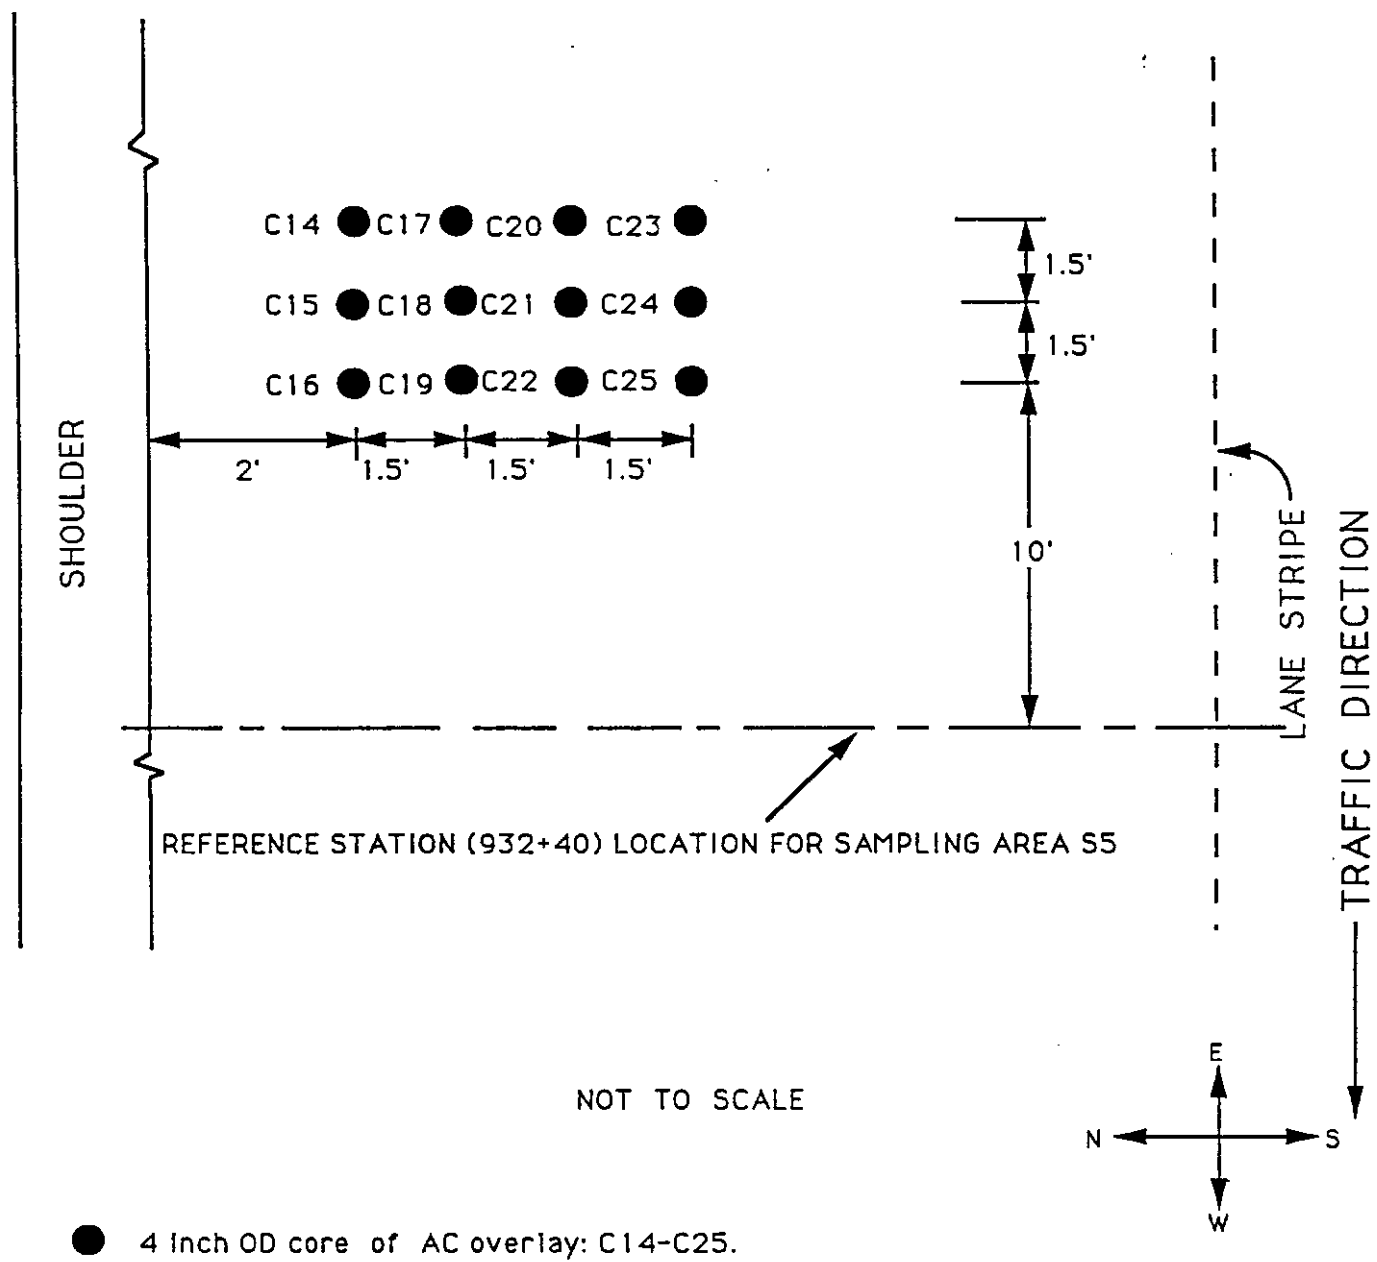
After overlay sampling plan for station 932+40 after section 7. Sampling area S5.
